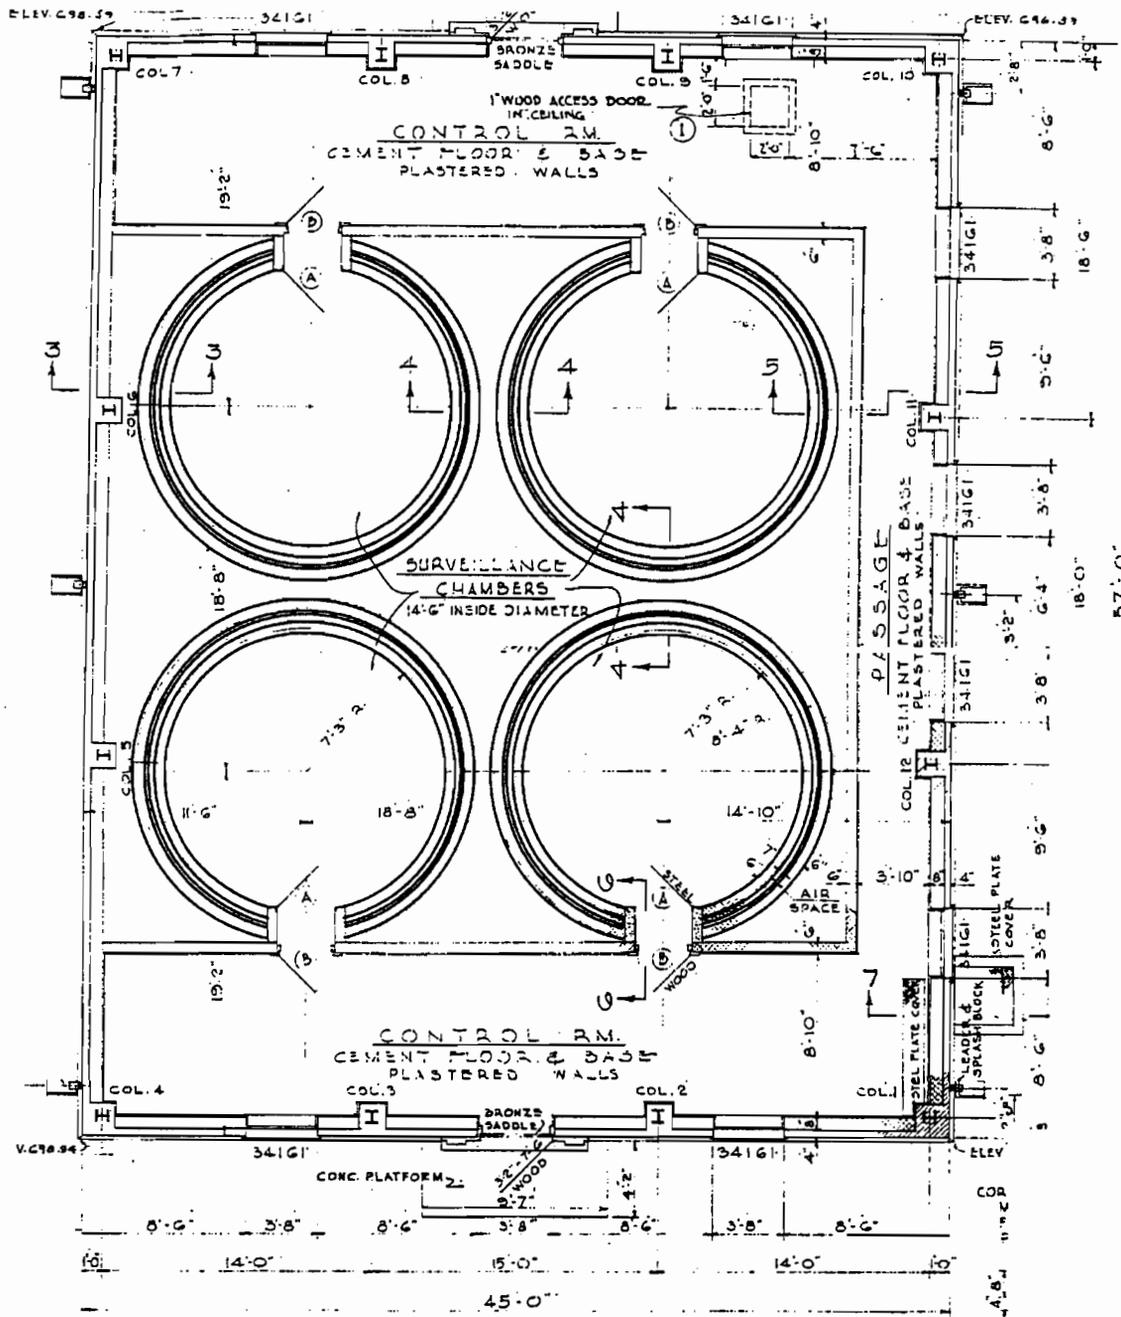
Building 166, Test Conditioning Chamber, Blueprint # DP-29054 detail of floor plan from *Buildings No. 166 & 197, High Temperature Surveillance Magazine, Floor Plans and Elevations*, March 15, 1941, War Plans Division, Ordnance Department. Picatinny Arsenal, Morris County, New Jersey (on file in DPW, Picatinny Arsenal).
